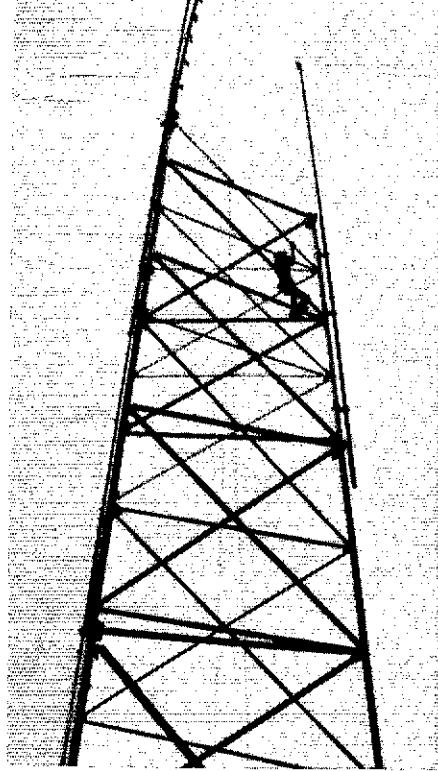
Gin poles are used to haul pieces into place as Ken Adamick, WD8RZE, assembles another section at 80 feet.
